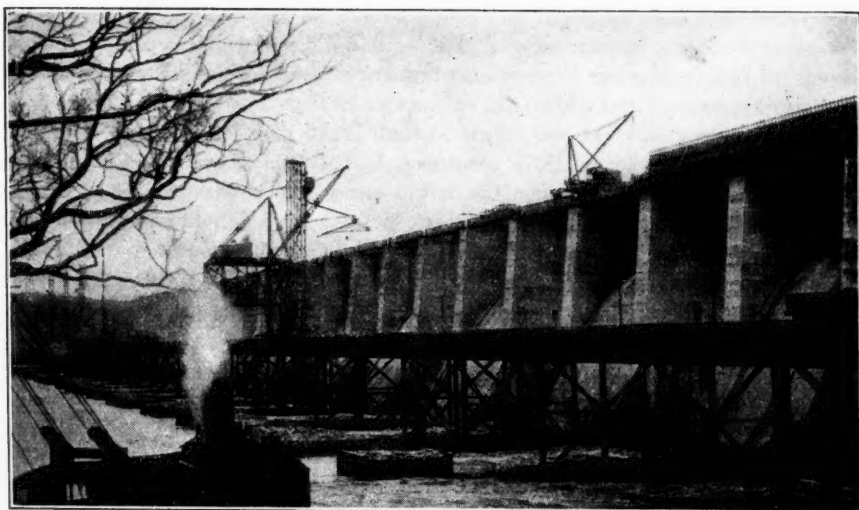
CONSTRUCTION BRIDGE WITH GANTRY AND MOVABLE TOWER.
